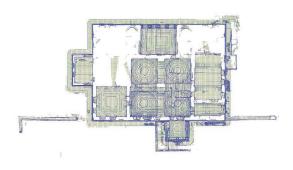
Plan view of the set section (distance between sections 0.25 m).
